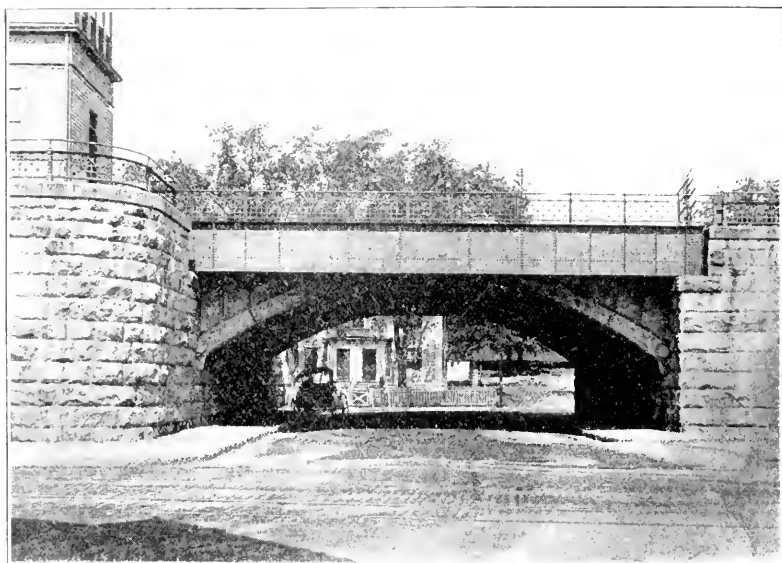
WALK HILL STREET STEEL ARCH, FOREST HILLS.
